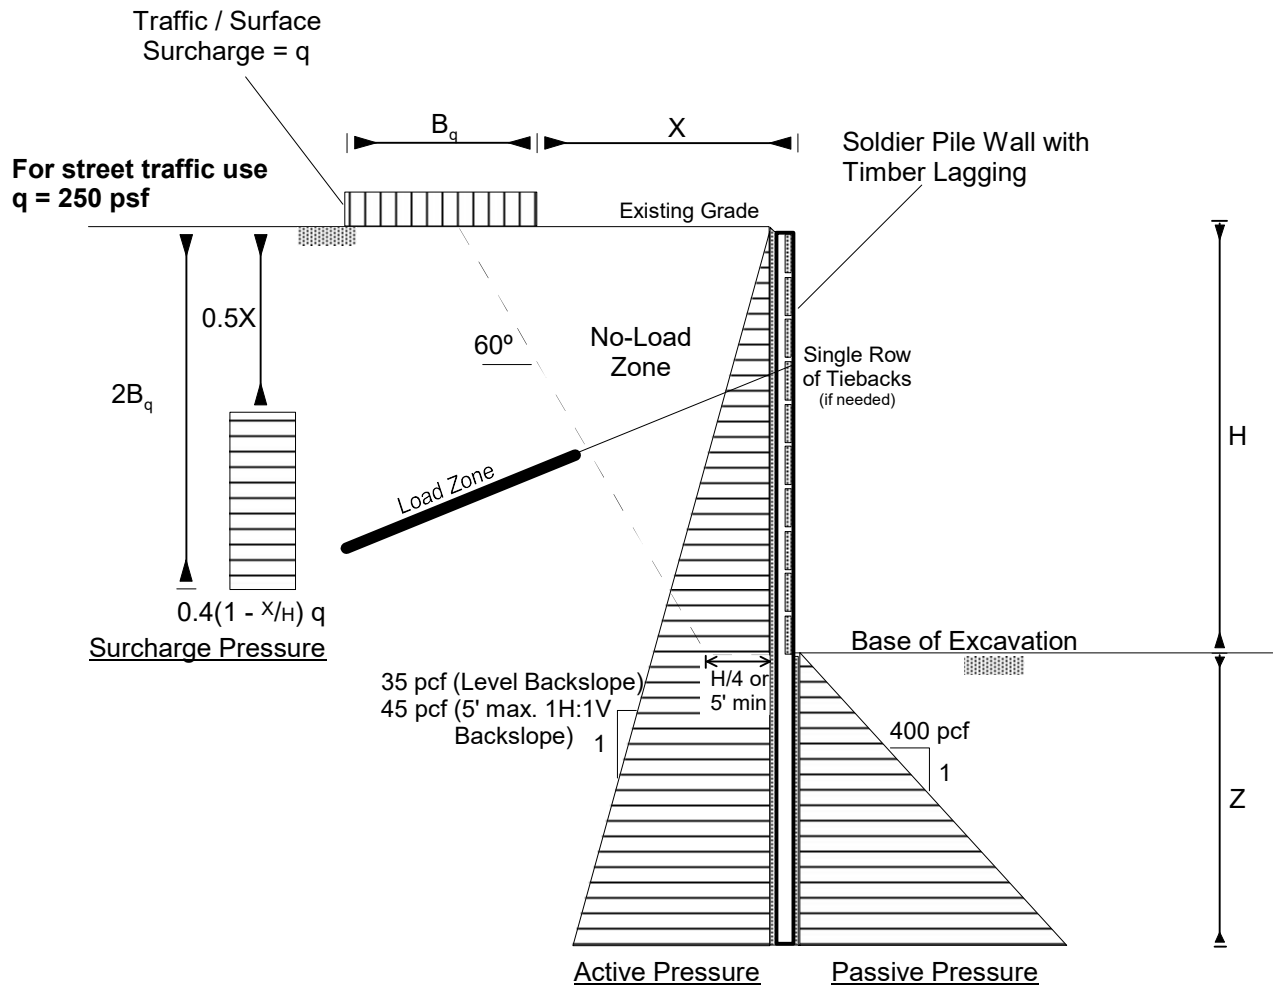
Fig. C Shoring Design Parameters – Cantilever / Single Tieback of Strut
